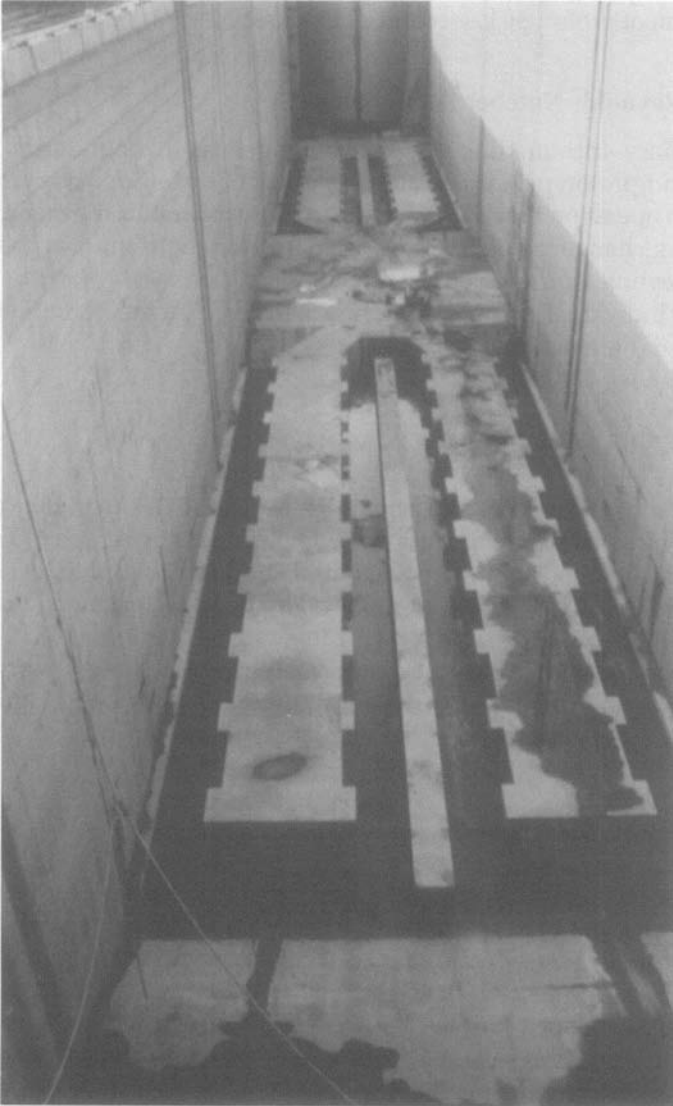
Bonneville Lock Chamber as Constructed.
